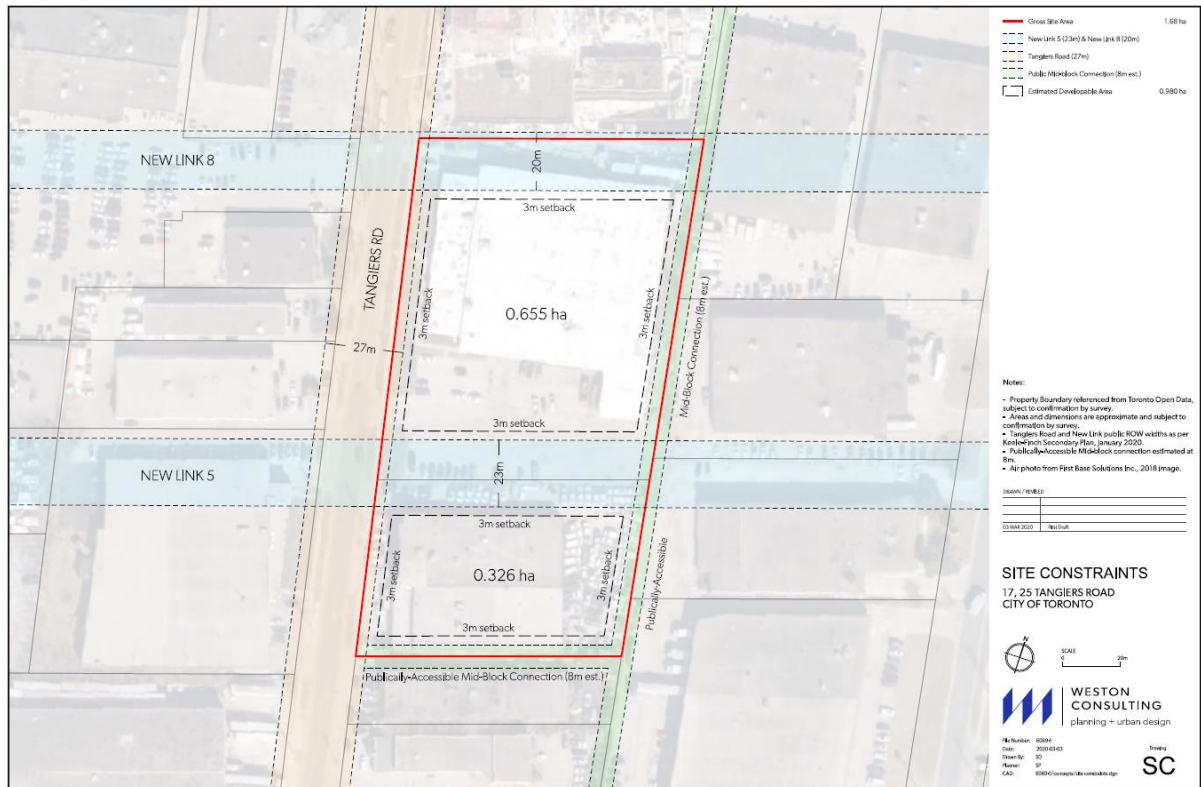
Site Constraints - 17 & 25 Tangiers Road
